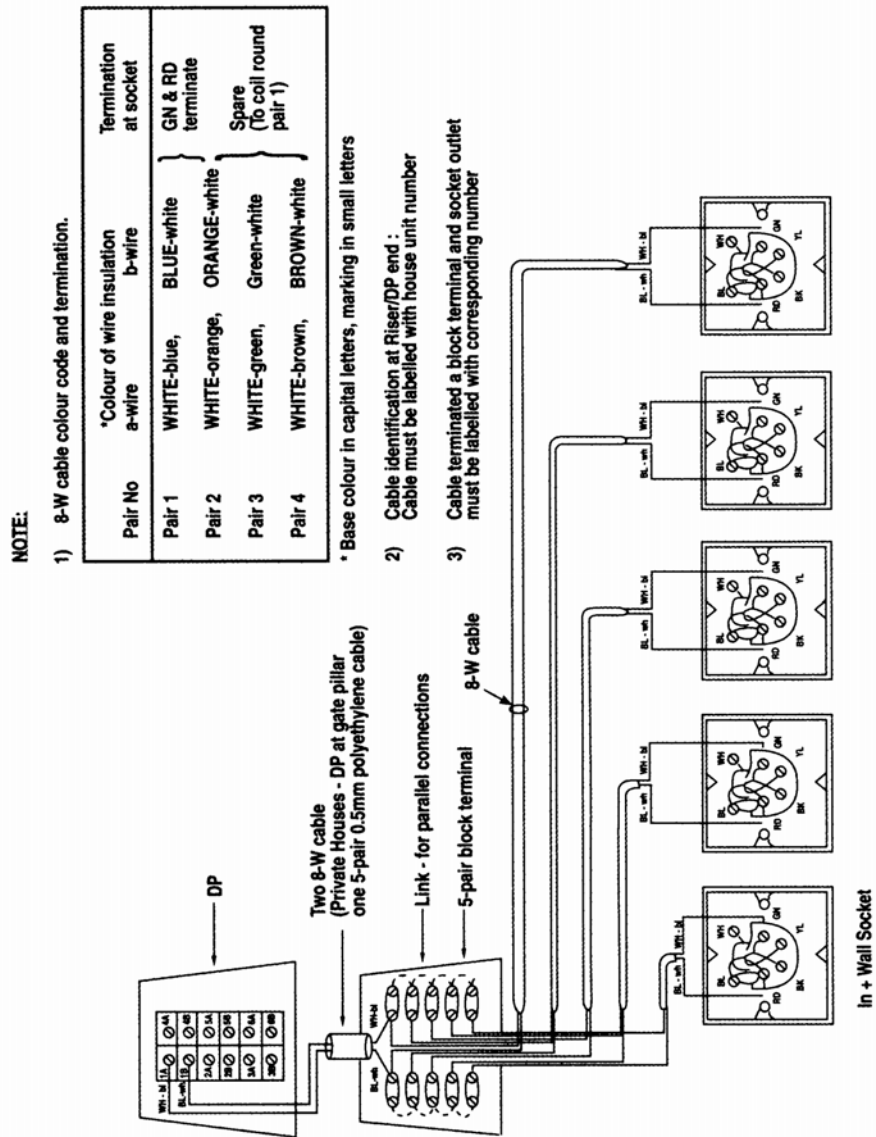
TELEPHONE WIRING CONFIGURATIONS FOR RESIDENTIAL BUILDING - DETAILED CONNECTIONS
